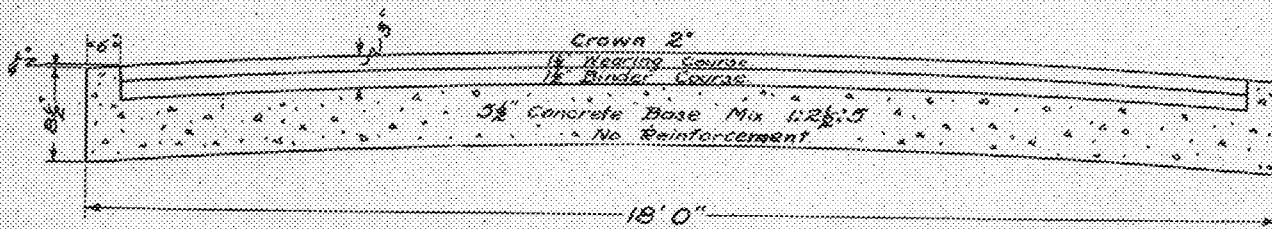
FIGURE B, CROSS SECTION TOPEKA WITH BINDER
